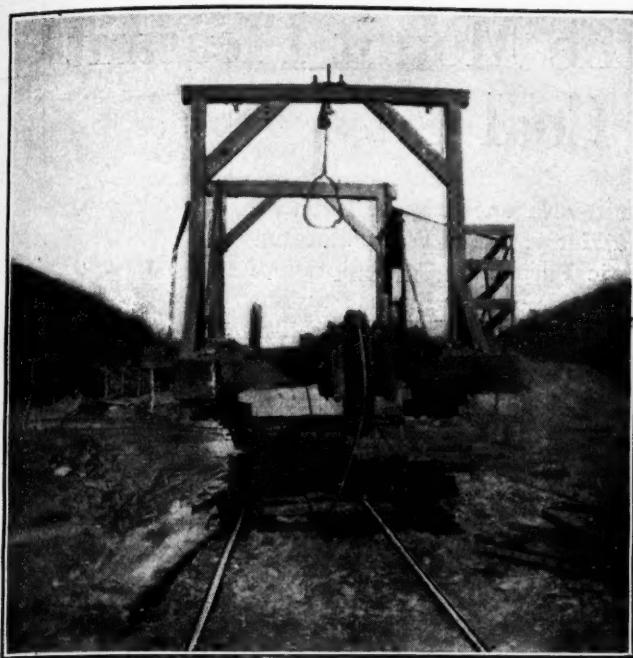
VIEW FROM THE FRONT, SHOWING SHEAVE
